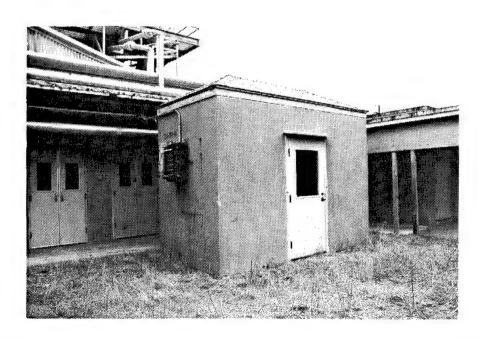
Building 2631-11: This Sprinkler Valve House contained the water main for the fire suppression/sprinkler system.
